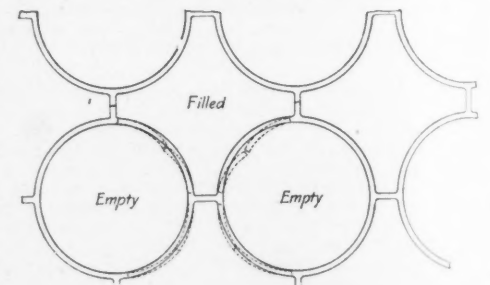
Part Sketch Plan Showing Arrangement of Bins and Probable Mode of Failure of Concrete-Steel Elevator, Duluth, Minn.
